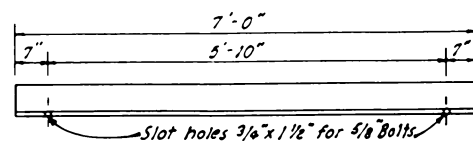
DETAIL OF SHEAR PLATE CONSTRUCTION JOINT
